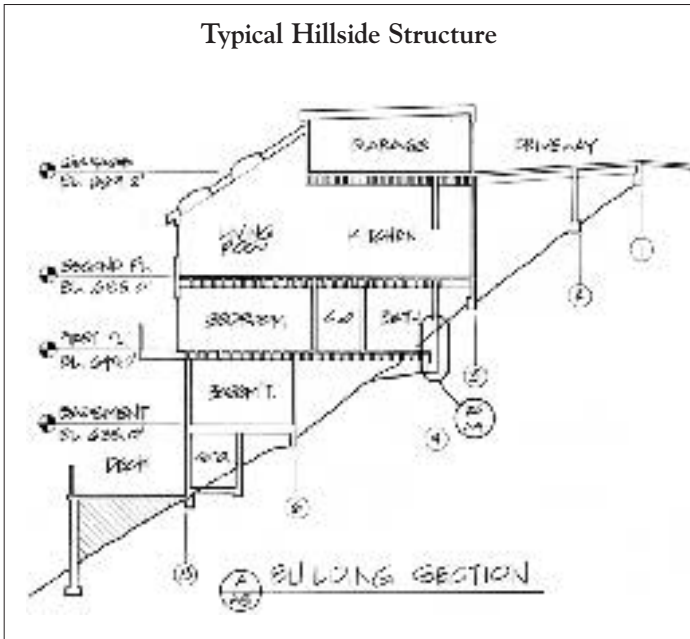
Steep hillside foundations have many more elevation changes than level ground foundations. Be sure to allow time to transfer elevation references from the plans to the field.
